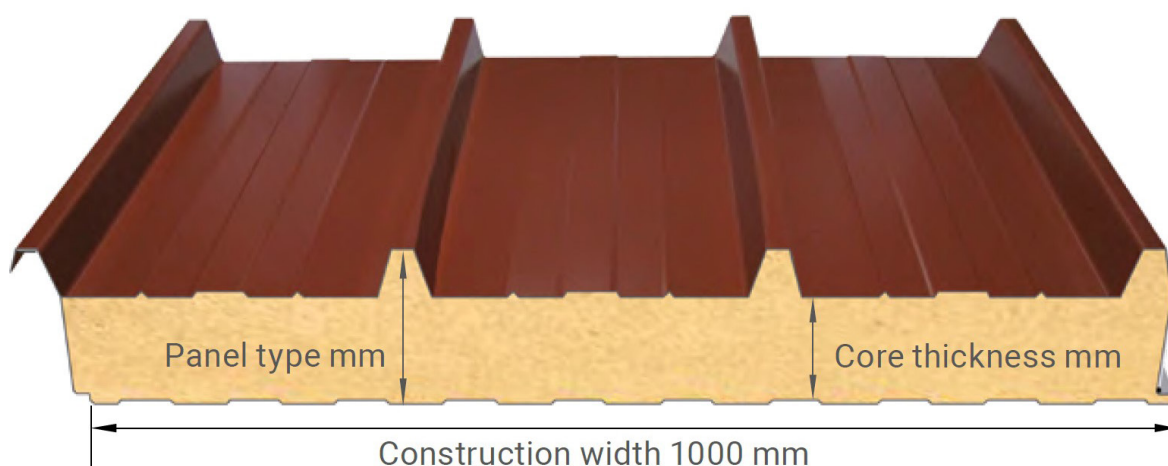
Brucha DP-H, sandwich panel for roof application with wood fibre core
